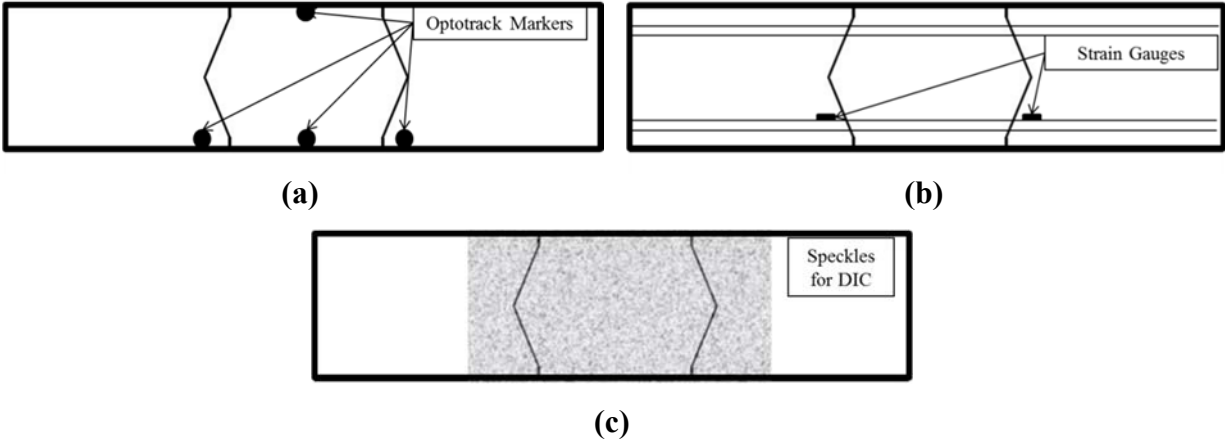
Instrumentation of the Precast Bridge Deck Beams
